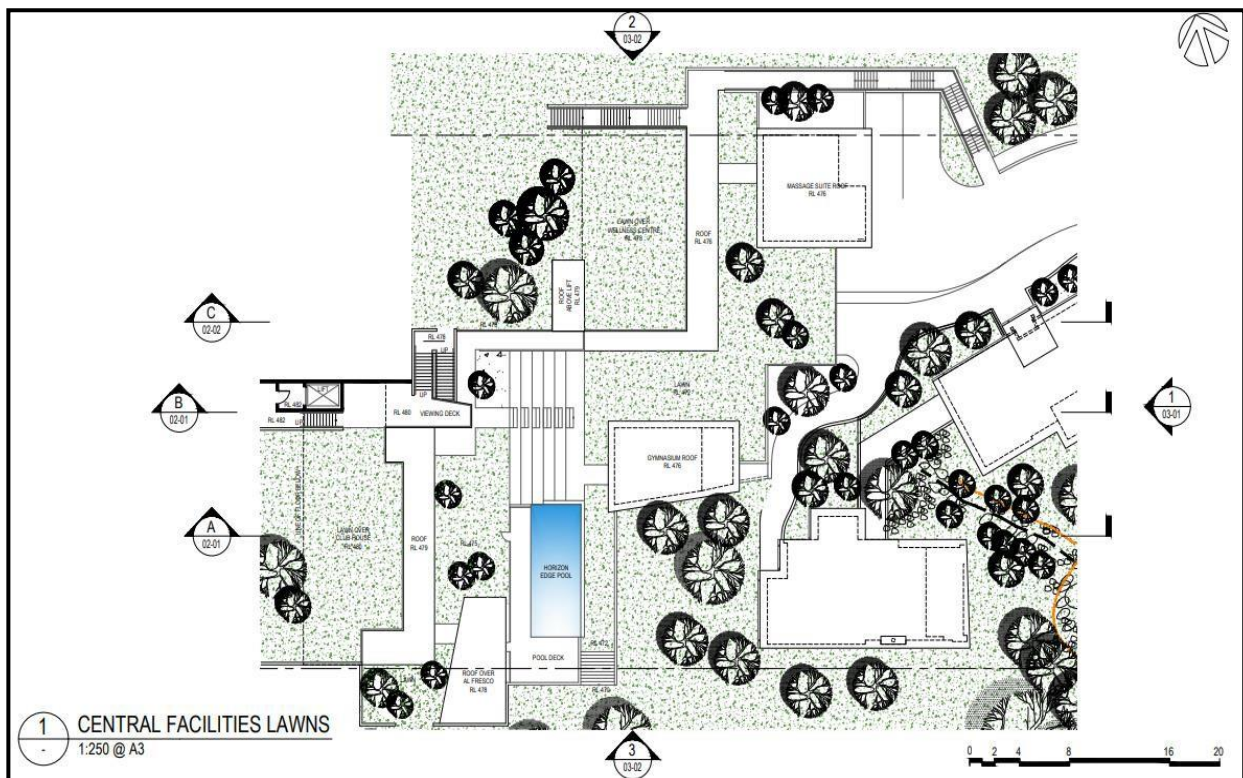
Proposed wellness facility design – Central Facilities lawns and green roof
